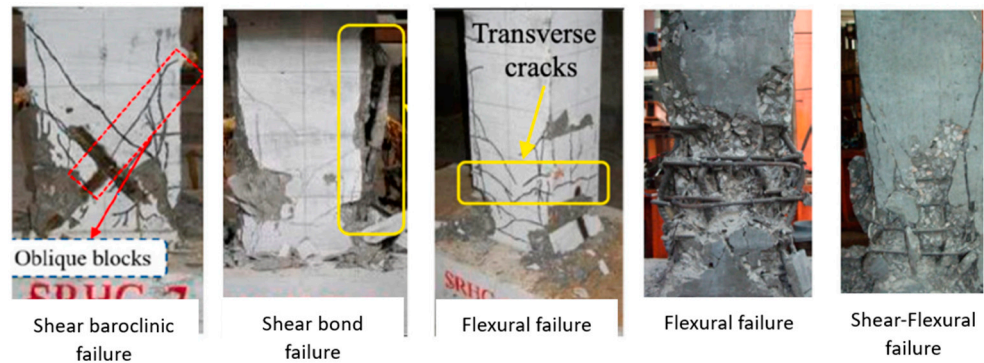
Typical failure mode of cyclically loaded high-strength CES column, reprinted with permission from [23], 2023, *Journal of Building Engineering*.
